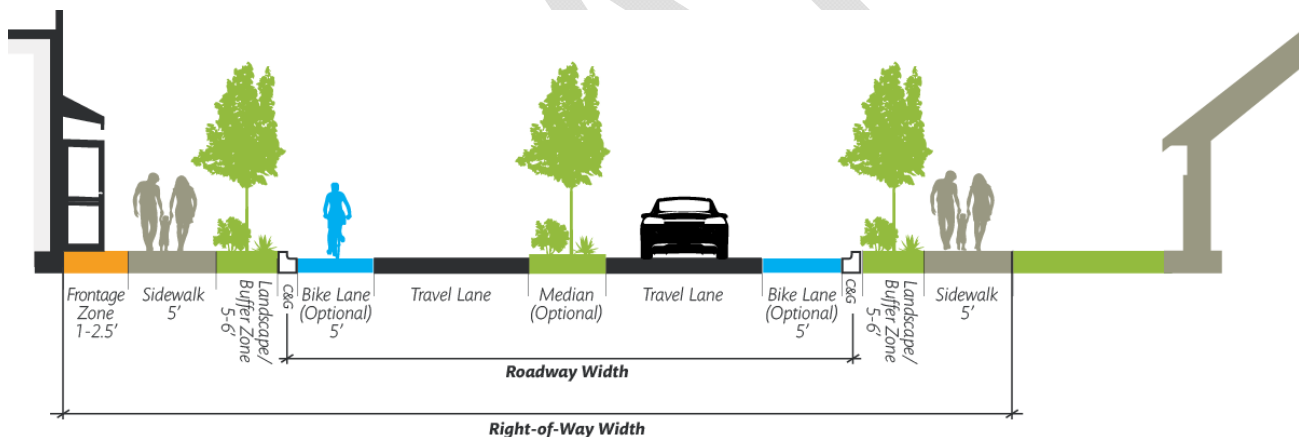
Typical Access Local and Normal Local Street Cross Section
